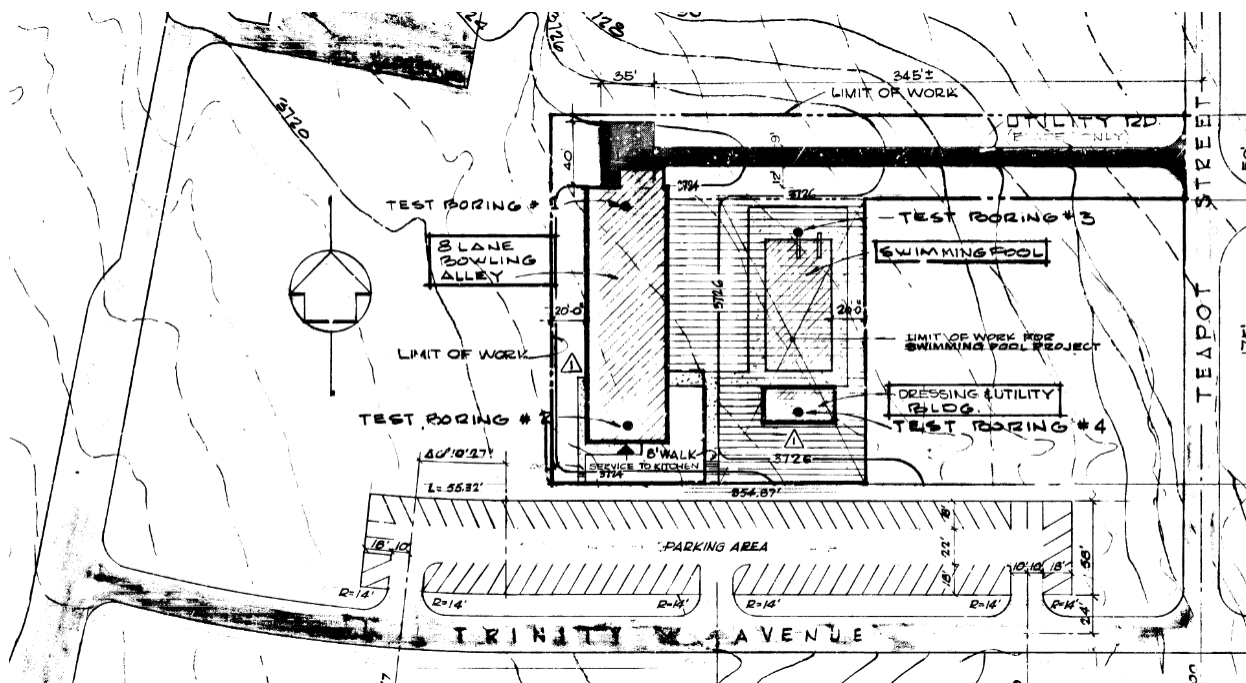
Construction drawing of the Bowling Alley, Swimming Pool, and Pool House (Selden and Stewart Drawing 34412, 1963). The Mercury Highway is at left.
